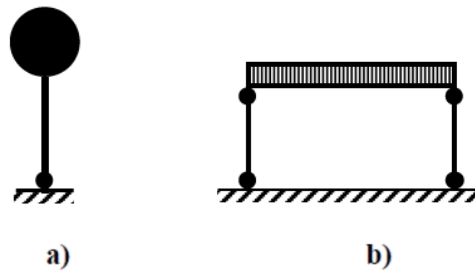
Inverted pendulum: a) dissipative zones at the column base; b) dissipative zones in columns ($N_{Ed,G}/N_{pl,Rd} \geq 0,3$)
